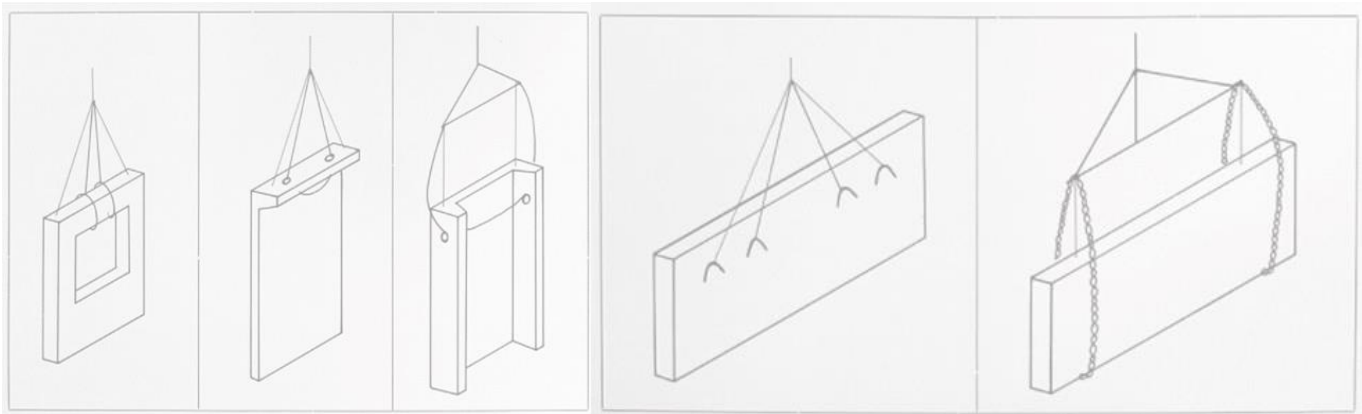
Assembling 3D façade panels during construction, (van de Voorde, 2012)
